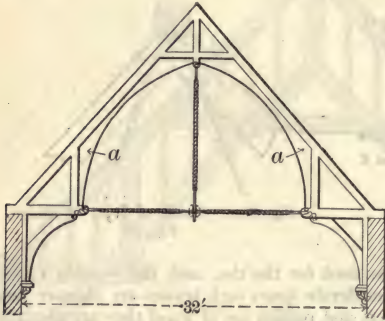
Hammer-beam Truss for Grace Chapel, New York City
